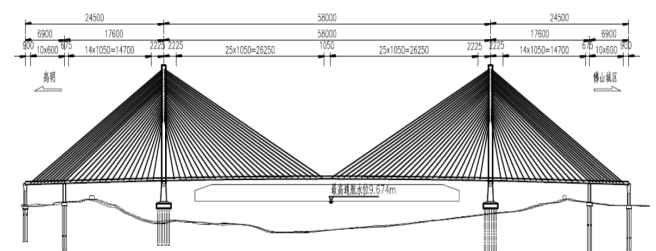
Schematic diagram of the bridge elevation arrangement (unit: cm).
